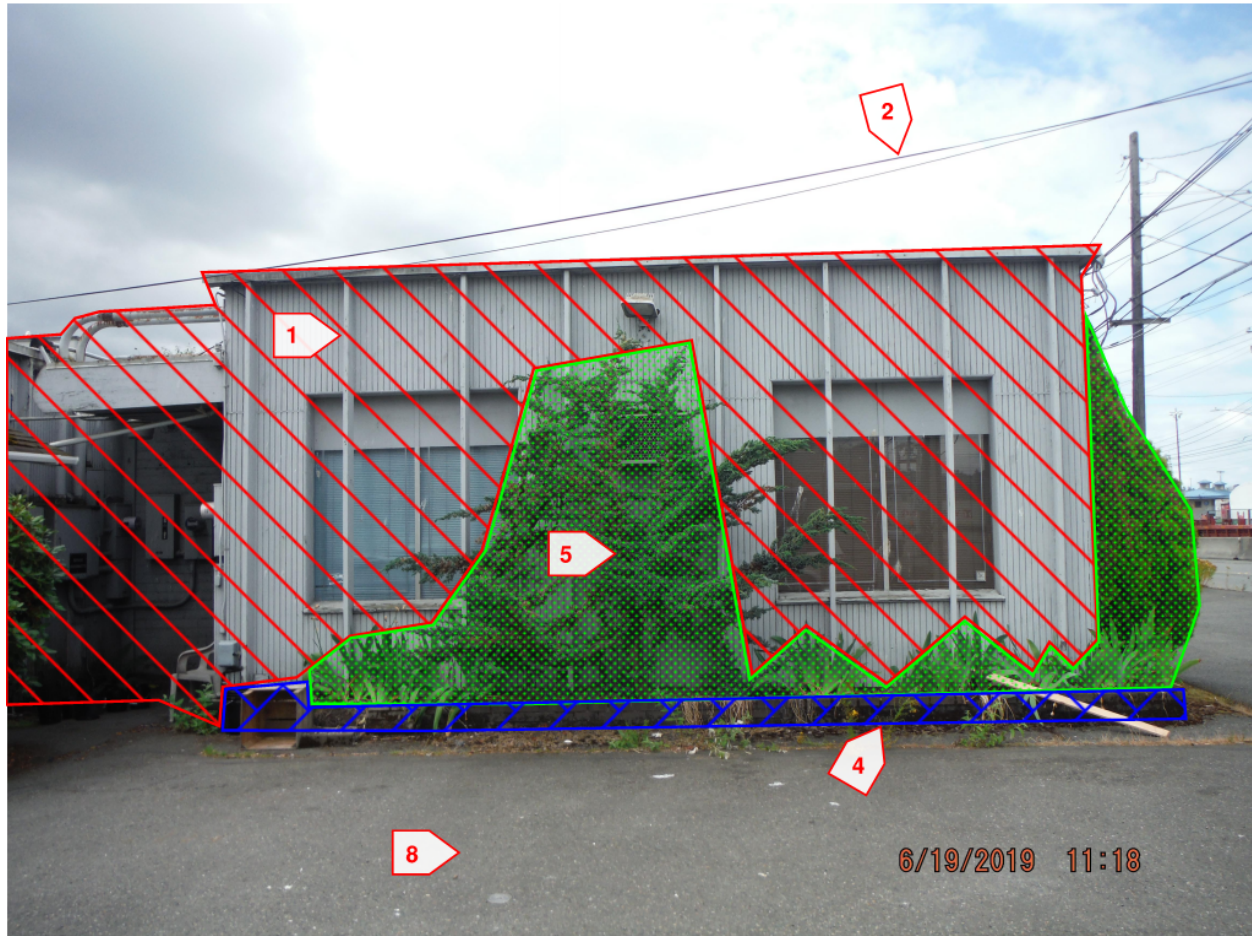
2338 E 11th Street Building Demolition Exterior Photograph
